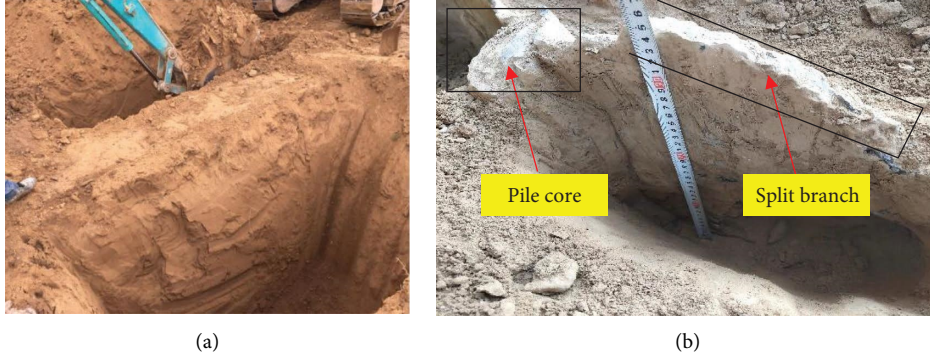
Site excavation: (a). Pile excavation; (b). Pile composition.
